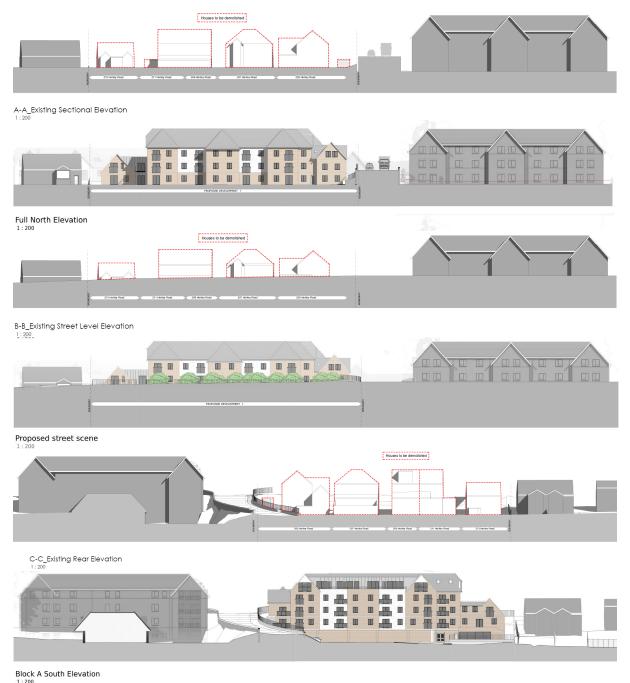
Existing and proposed front and rear full elevations and streetscenes (taking account of topography) within the context of neighbouring buildings
